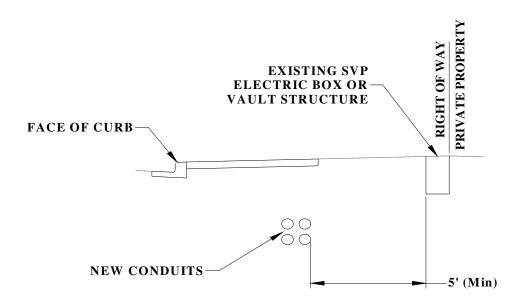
Separation Between New Conduits and Existing SVP Boxes
